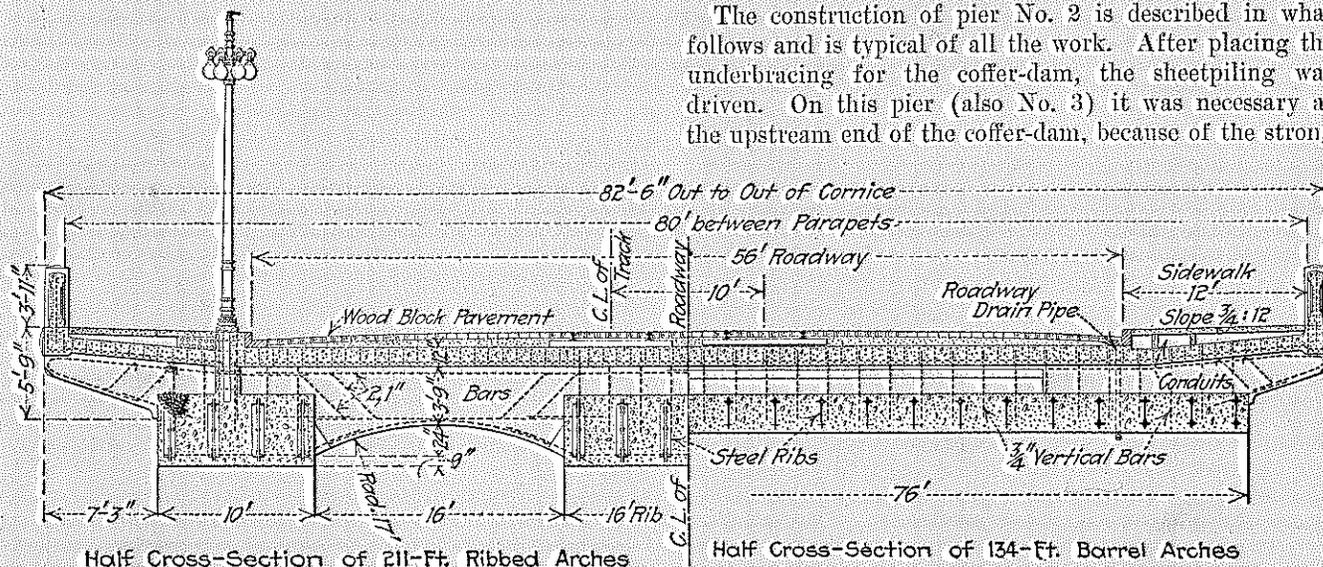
CROSS-SECTION OF THE CONCRETE ARCH BRIDGE AT THIRD AVE., MINNEAPOLIS, MINN.
